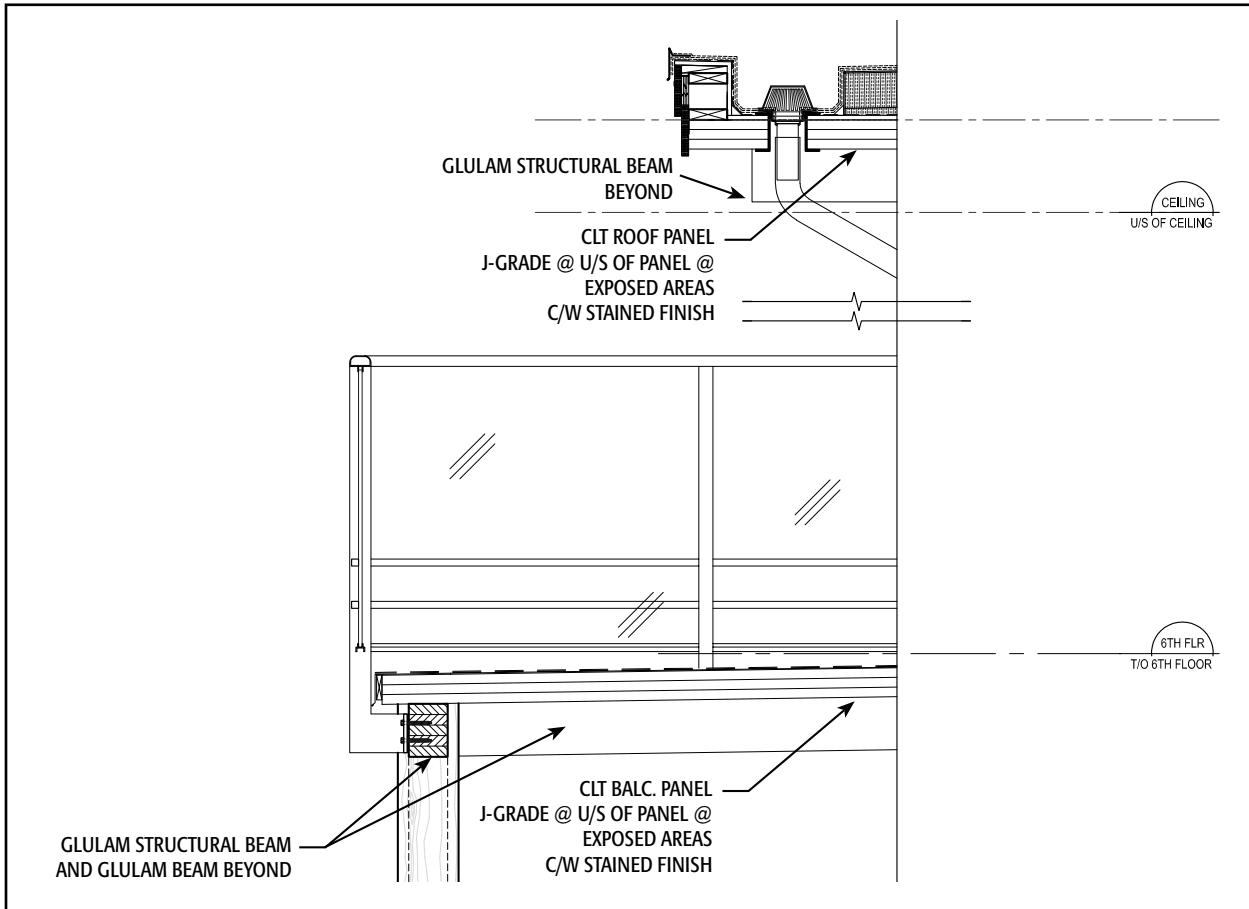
Detail section at balcony showing CLT floor panels supported on projecting glulam beams
